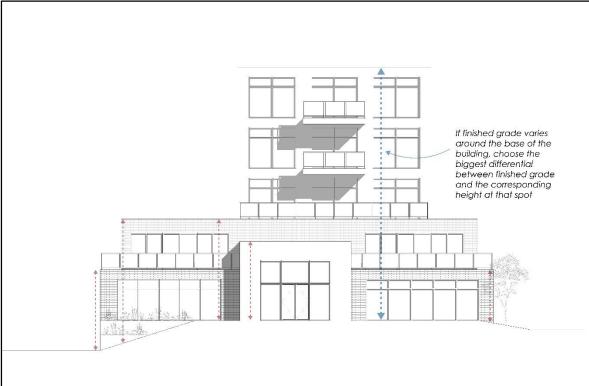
(c) – Finished Grade: Sloped Fronting Road
